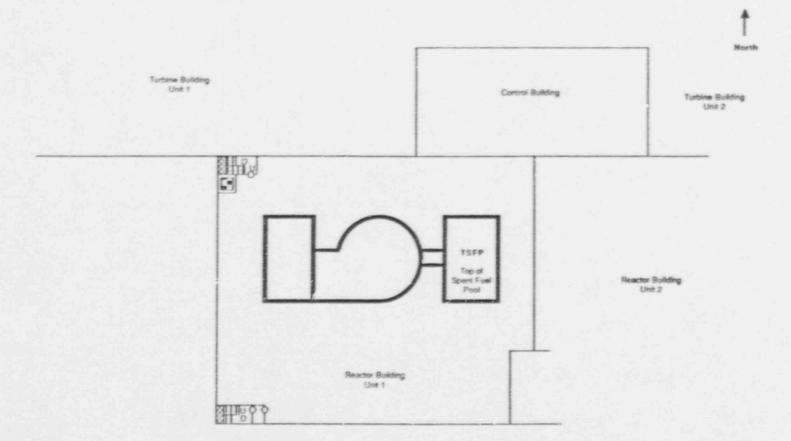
Limerick 1 General Arrangment, Elevation 352'
